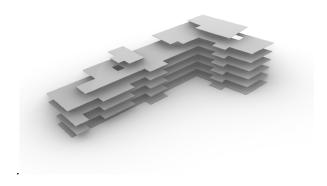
3D model of slabs, including roof, interior floor, overhang, ground floor
